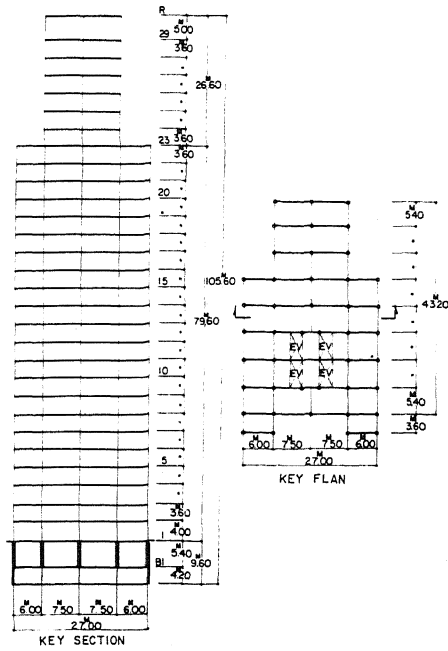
KEY PLAN AND SECTION OF THE TOWER BUILDING
